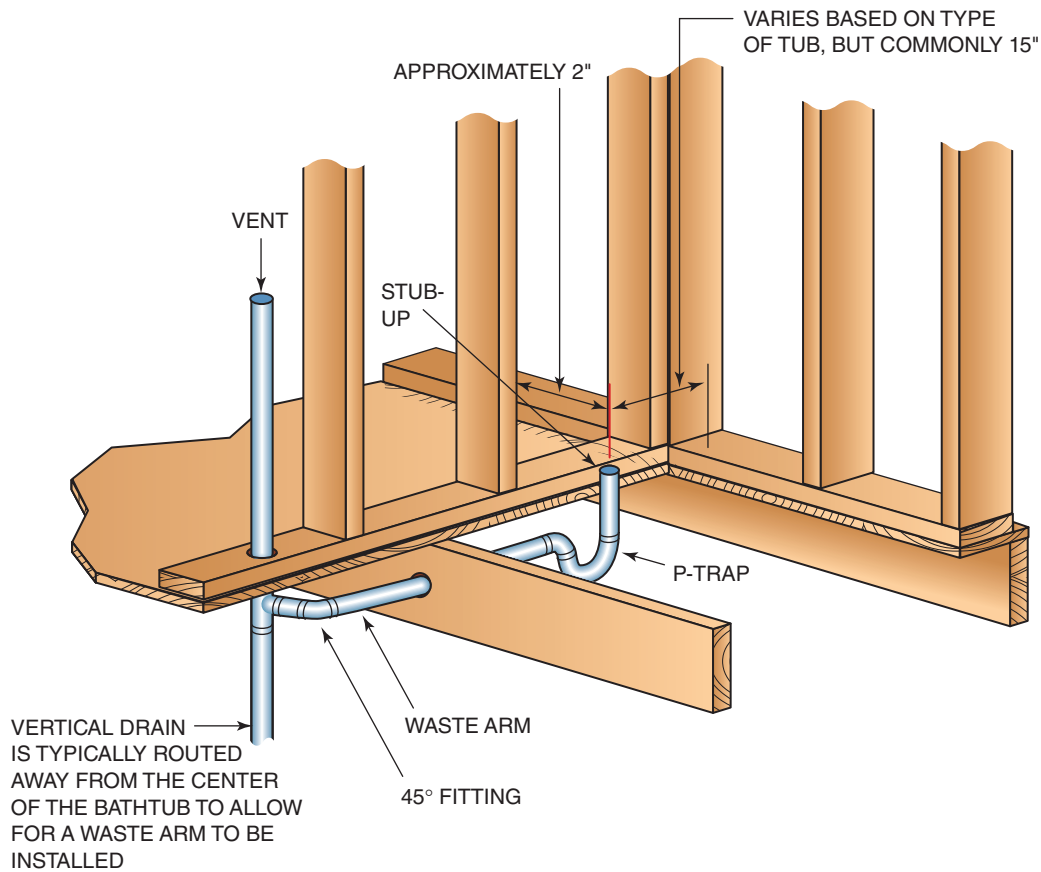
A waste arm is used to create an exact piping configuration to a bathtub.
